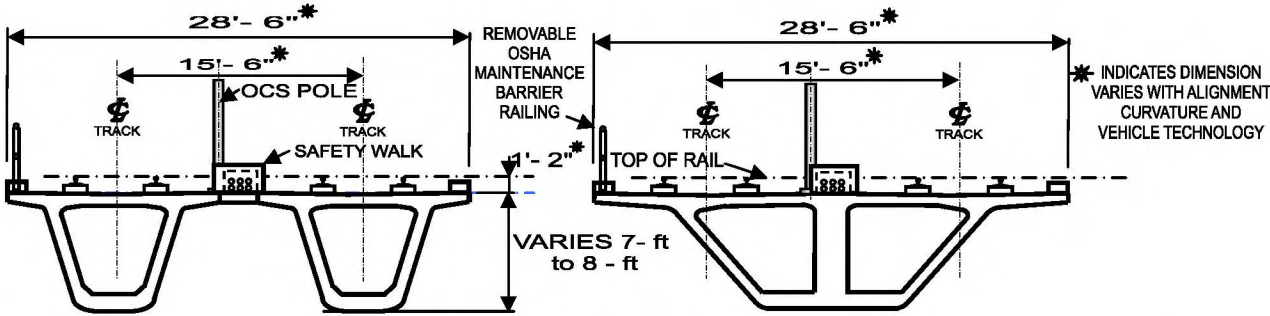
Rail Transit Single Track Girders (left) and Dual Track Girders
